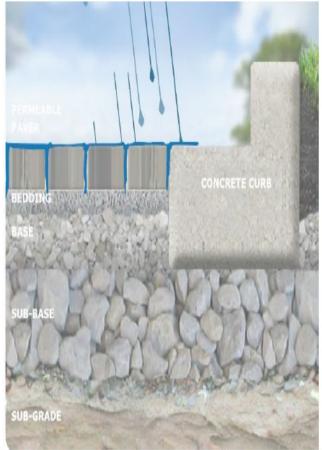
Example of a Permeable Paver Parking Lot Cross-Section (APT, 2011) (MWRD, 2015)
